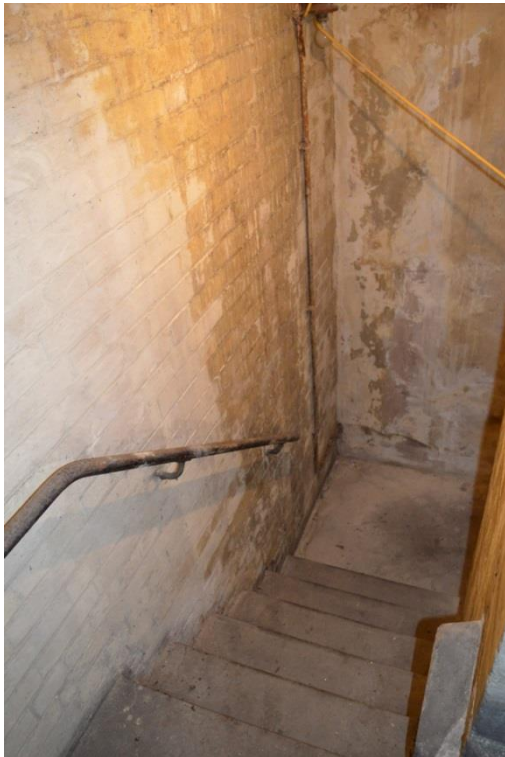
Second floor, east wing, view of enclosed staircase, facing west
